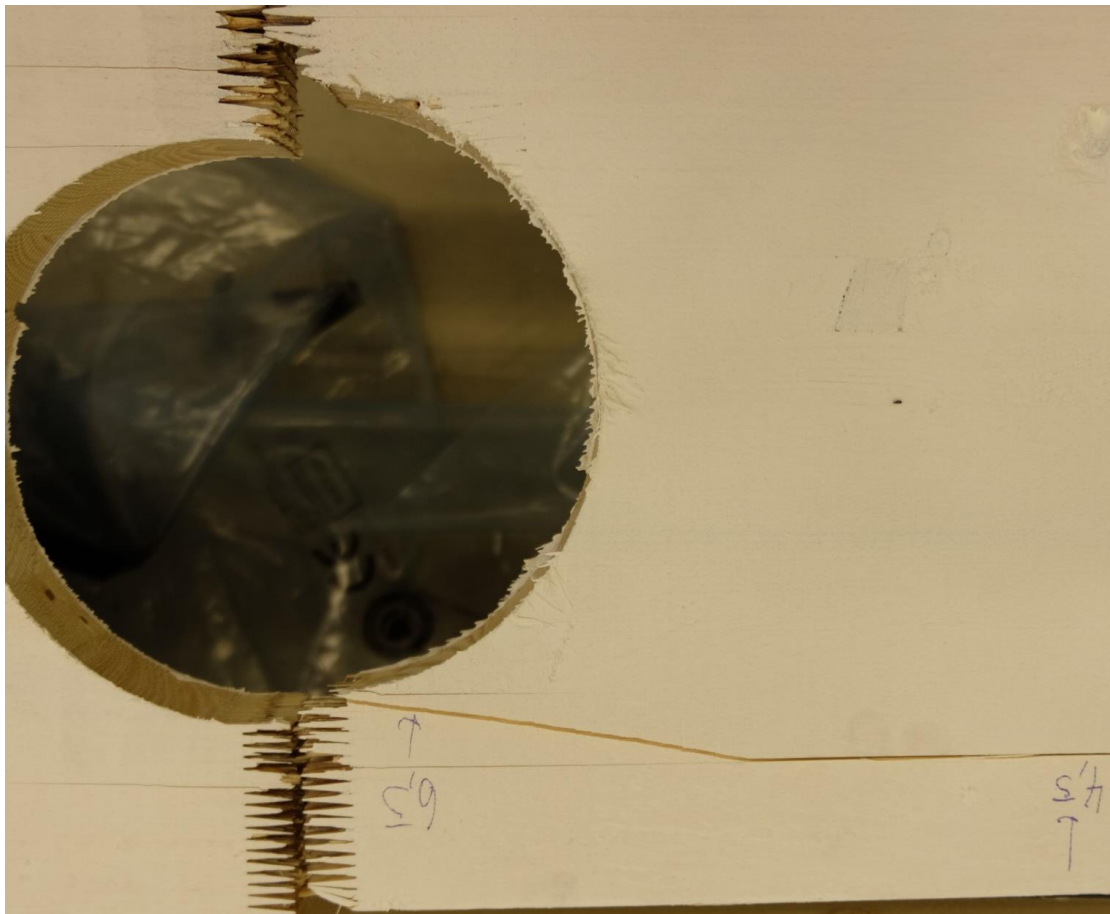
Failure cause of A2 at the right hole. Tensile stress perpendicular to the grain and finger-joint failure.
